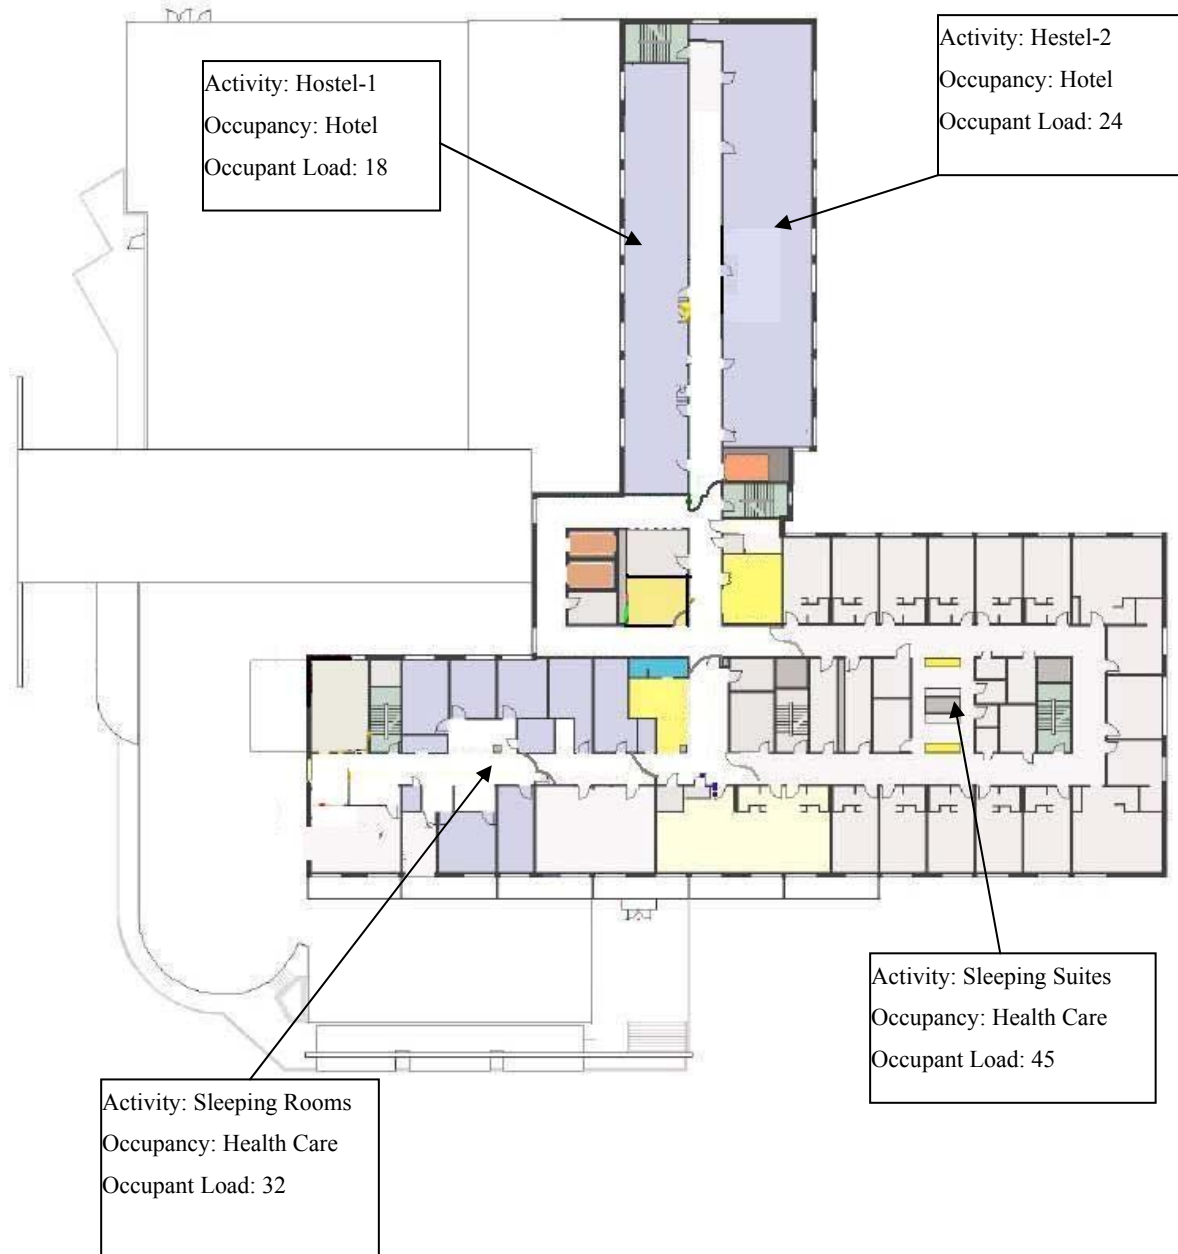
Activity, occupancy type and occupant load on floor 3
